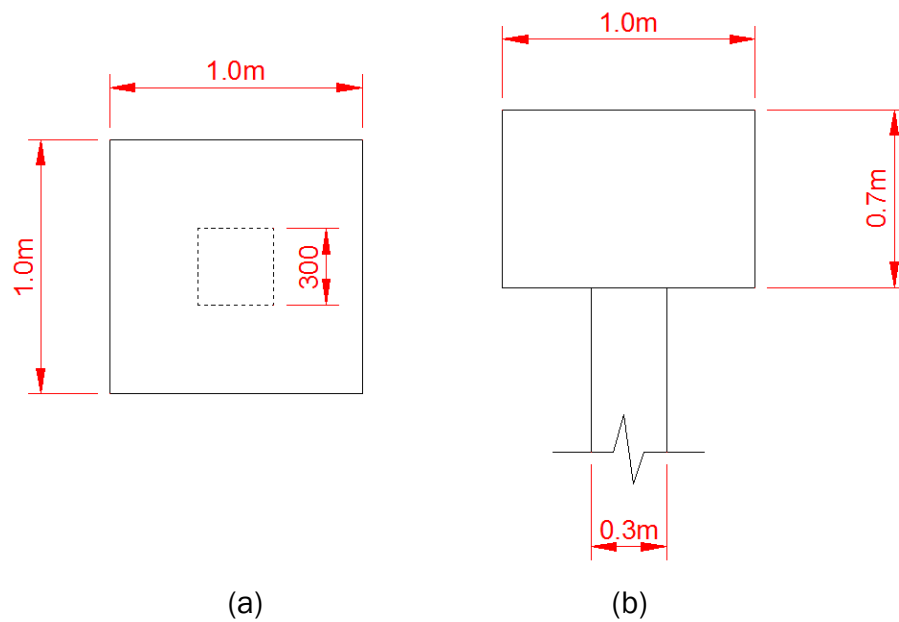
(a) plan of pile cap (b) section through pile and pile cap
